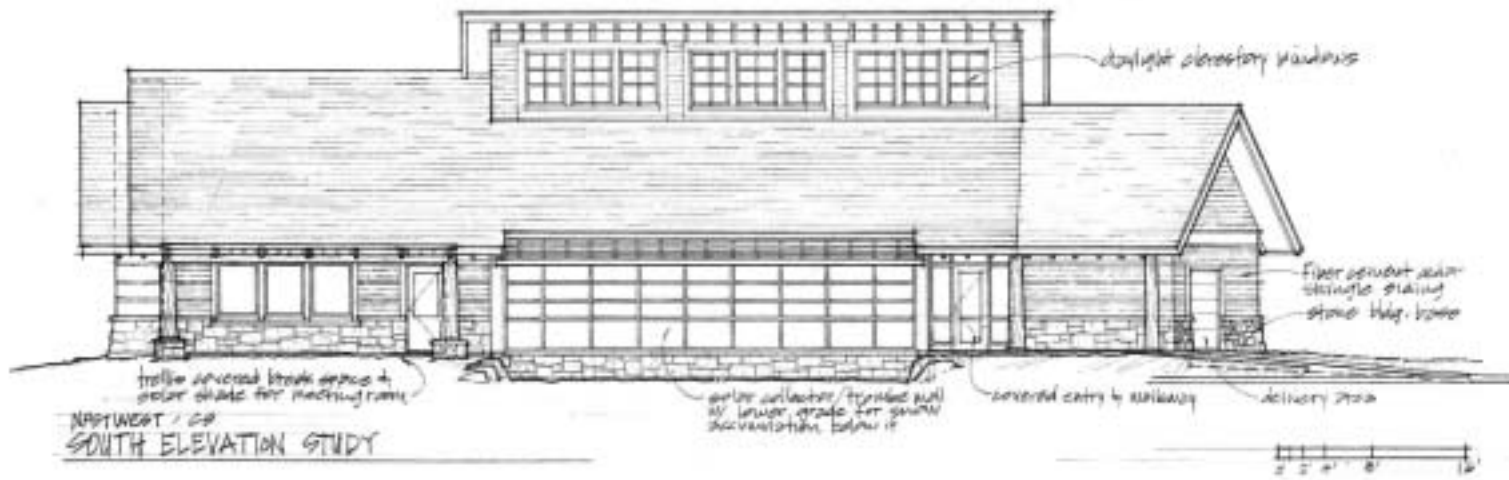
, Continued: Alternative 2 New Administration Building Site Elevation, South View
